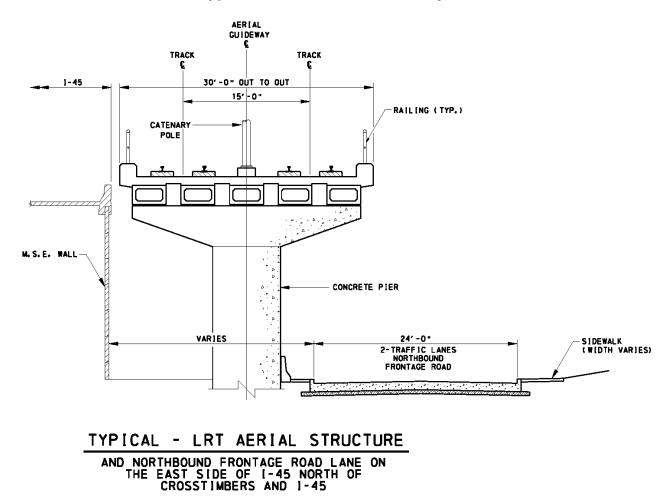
Typical LRT Aerial Structure Adjacent to IH-45
